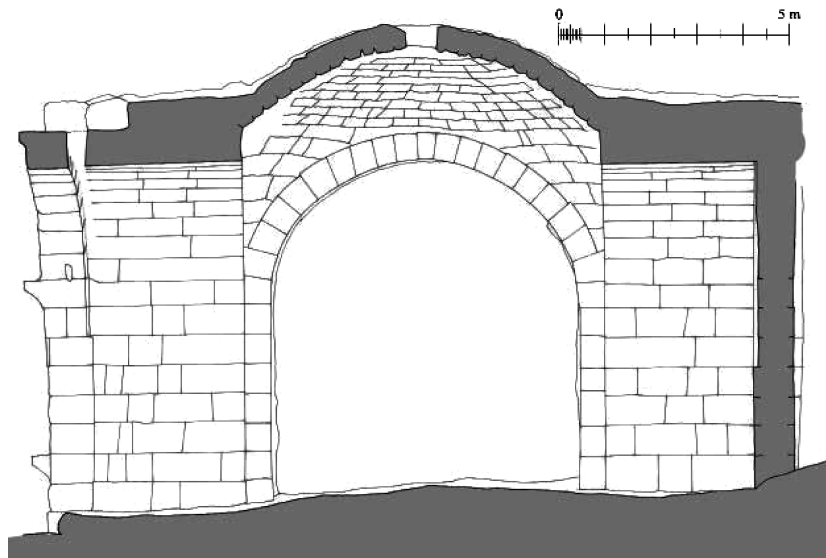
Jerash, section of West Baths, looking from the west to the east
